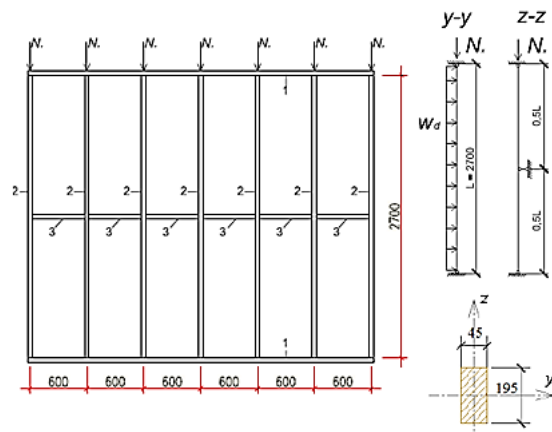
Design scheme of the struts in shear walls in planes y-y and z-z. 1 – head binders; 2 – struts; 3 – cross-bars [8].
